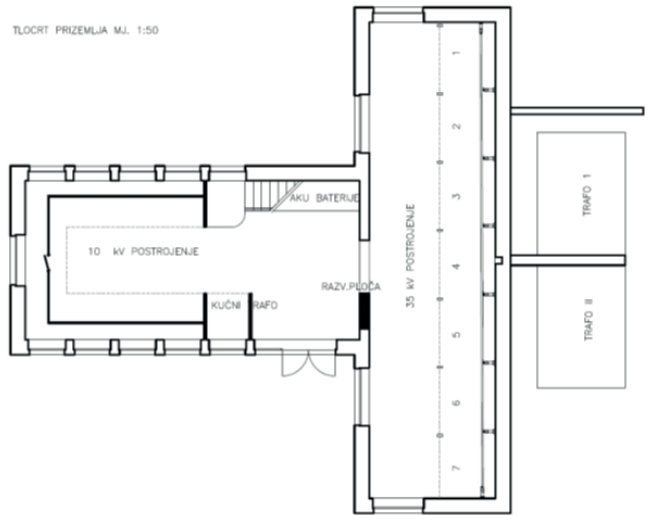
The layout of the plant (the ground floor's plan) before reconstruction
